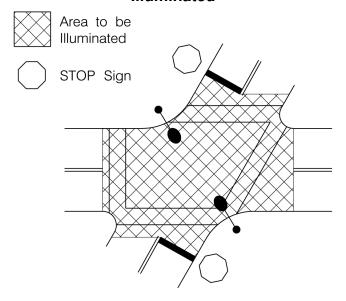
Complex Intersection, Typical Lighting Layout and Area to be Illuminated
